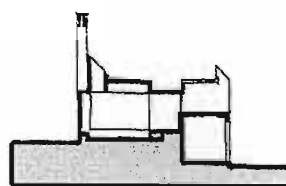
BDG – House Wilson(1973). Plan. Ref: Plan 74.3: p9.
